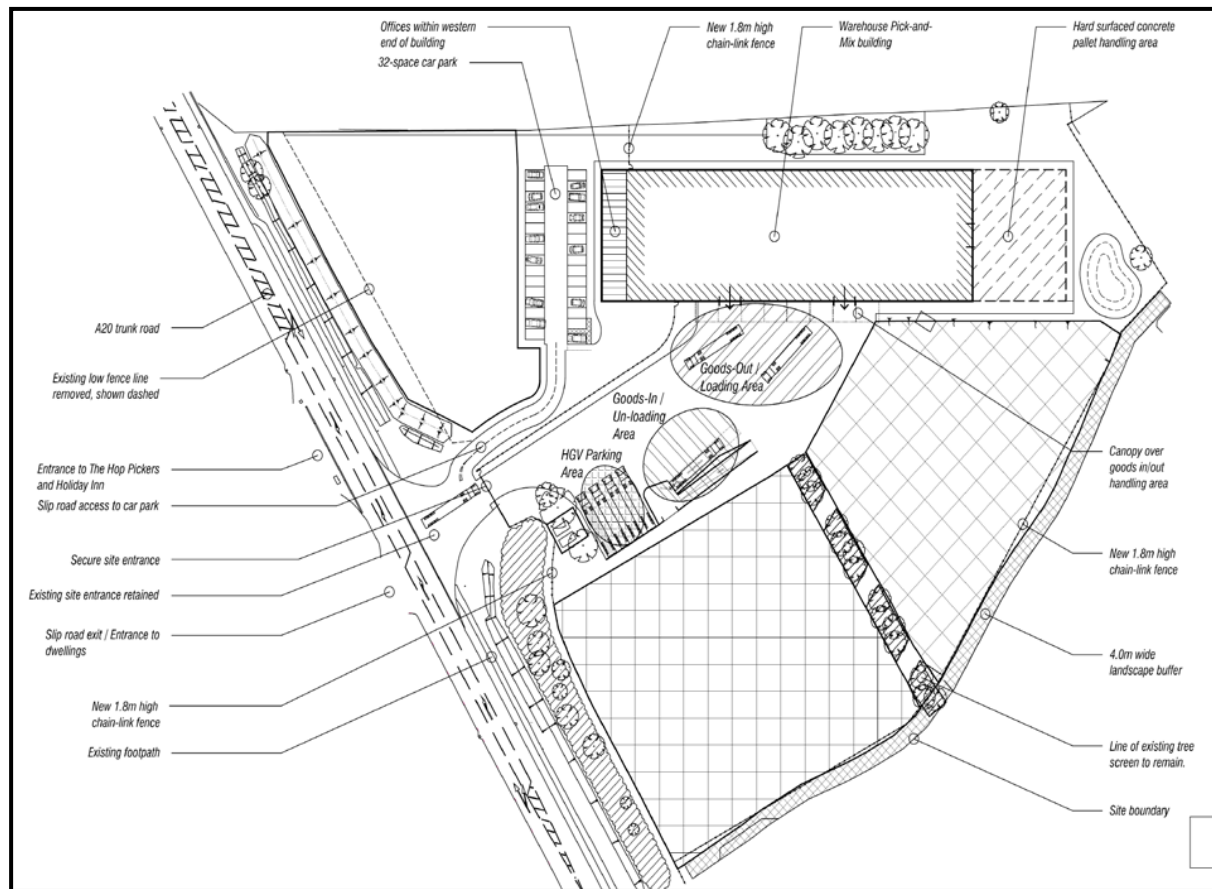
Site Layout Plan - previously approved - to remain unchanged
